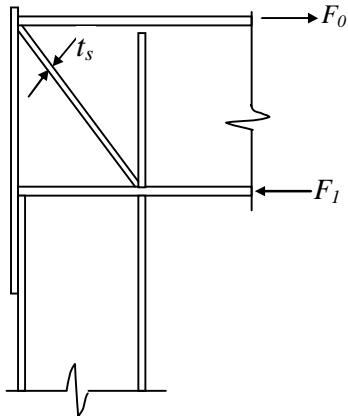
Forces and Stresses Assumed to act on Unstiffened Straight Corner Connection
